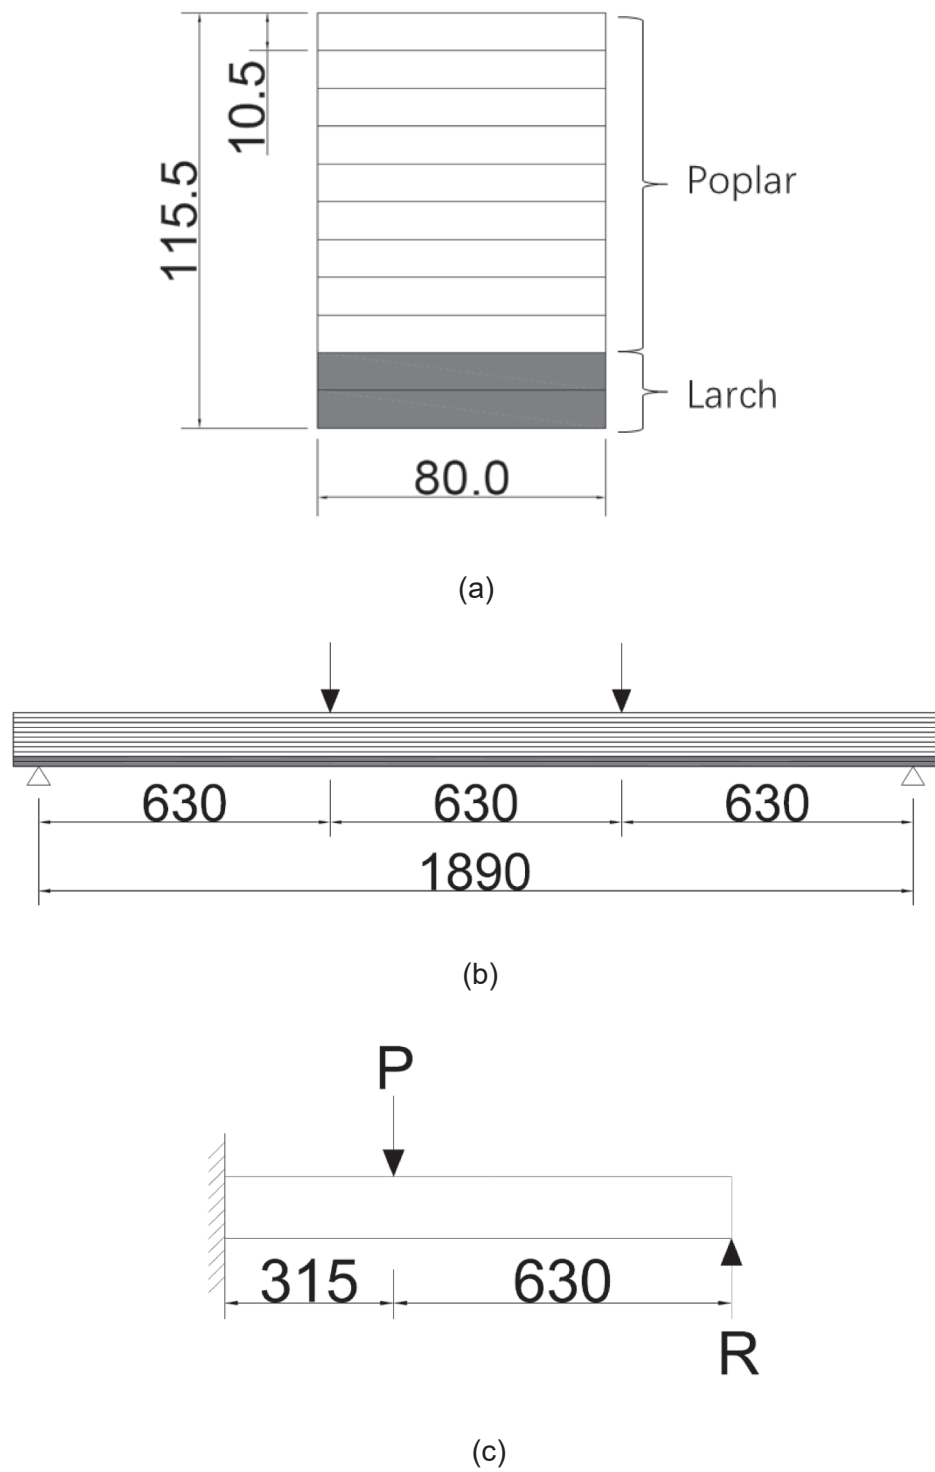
Poplar-larch hybrid timber beam - (a) Stacking sequence in section (dimensions in mm) (b) Elevation (c). Cantilever computational model.
